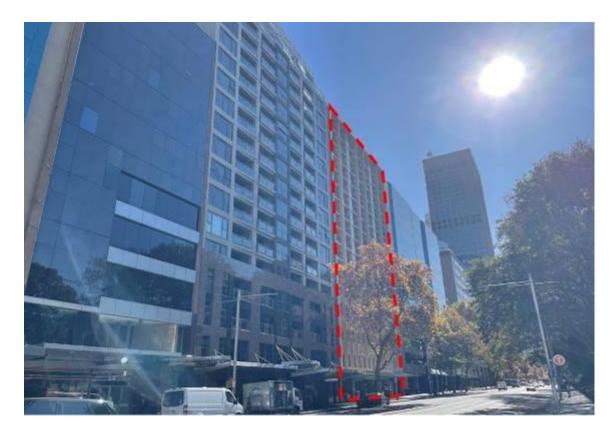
Site and adjoining buildings along Elizabeth Street, facing north
